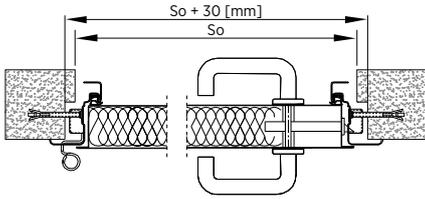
Installation of the single-leaf door with the corner frame in a masonry wall, horizontal cross-section
